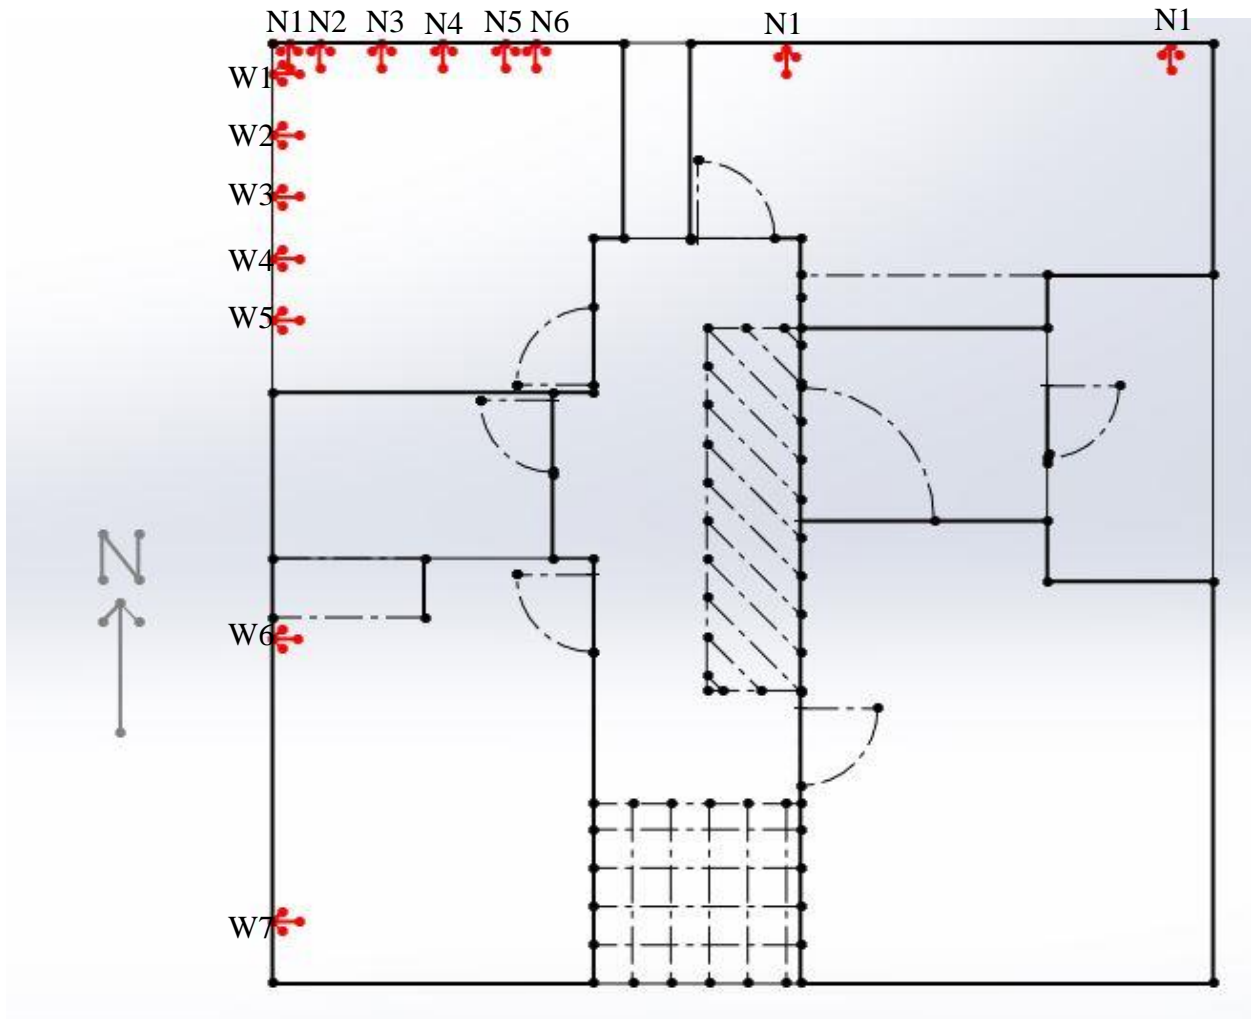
Instrumentation plan for the test with no brick veneer in place.
